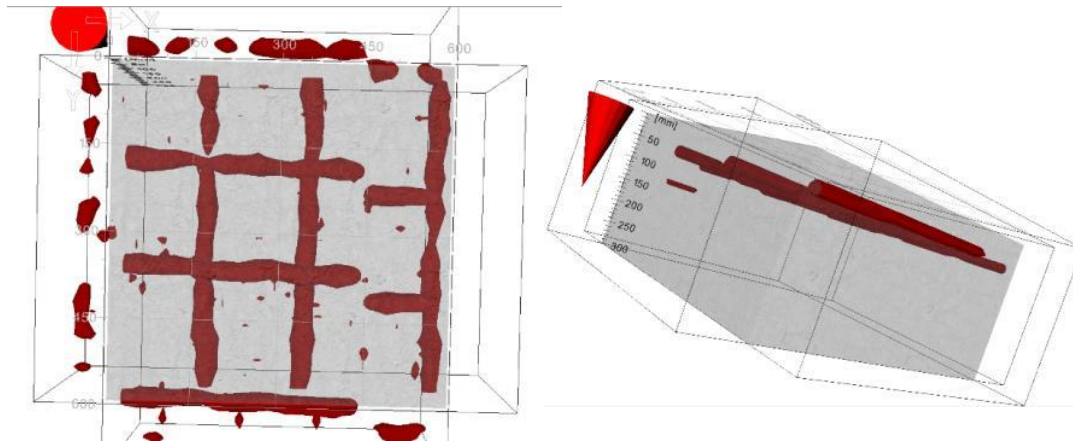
3D view of GPR scan of floor showing the rebar details and other metallic object or voids
